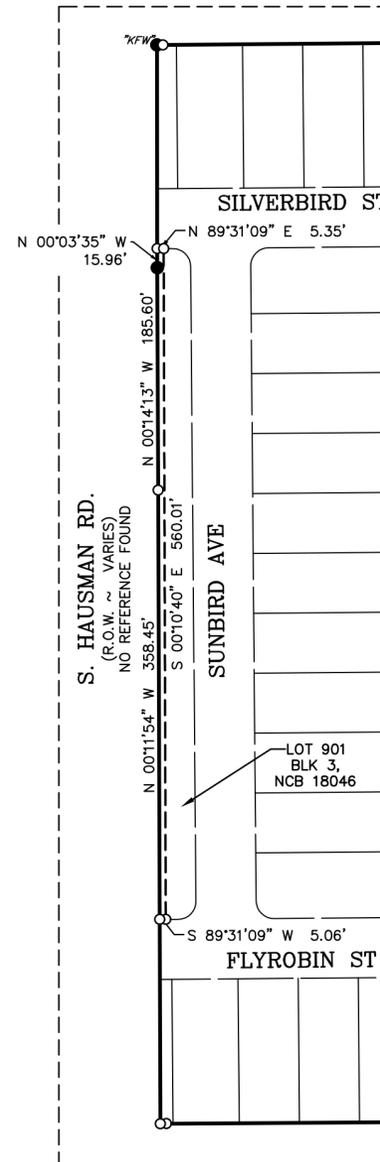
DETAIL "D" NOT TO SCALE SEE SHEET 2 OF 3
